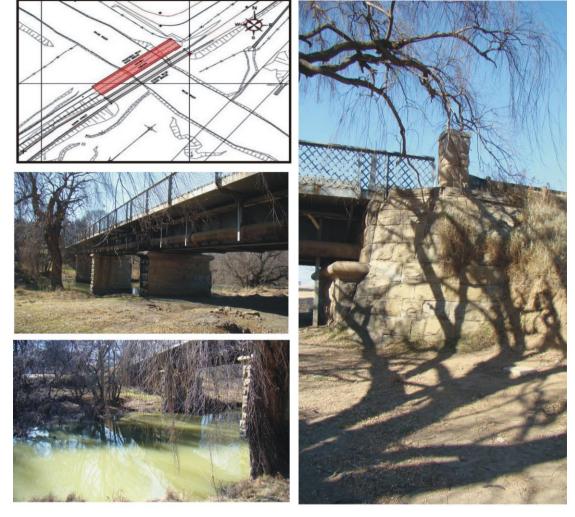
The Hamilton Bridge. Position of the proposed new additional bridge (left) and masonry substructure of Hamilton Bridge (right).
